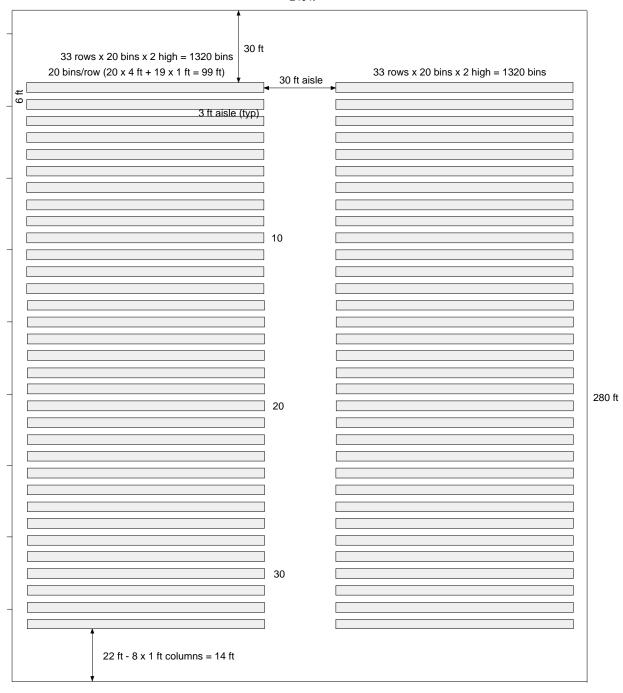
U3O8 Storage Building Plan Conversion to U3O8 and CaF2
